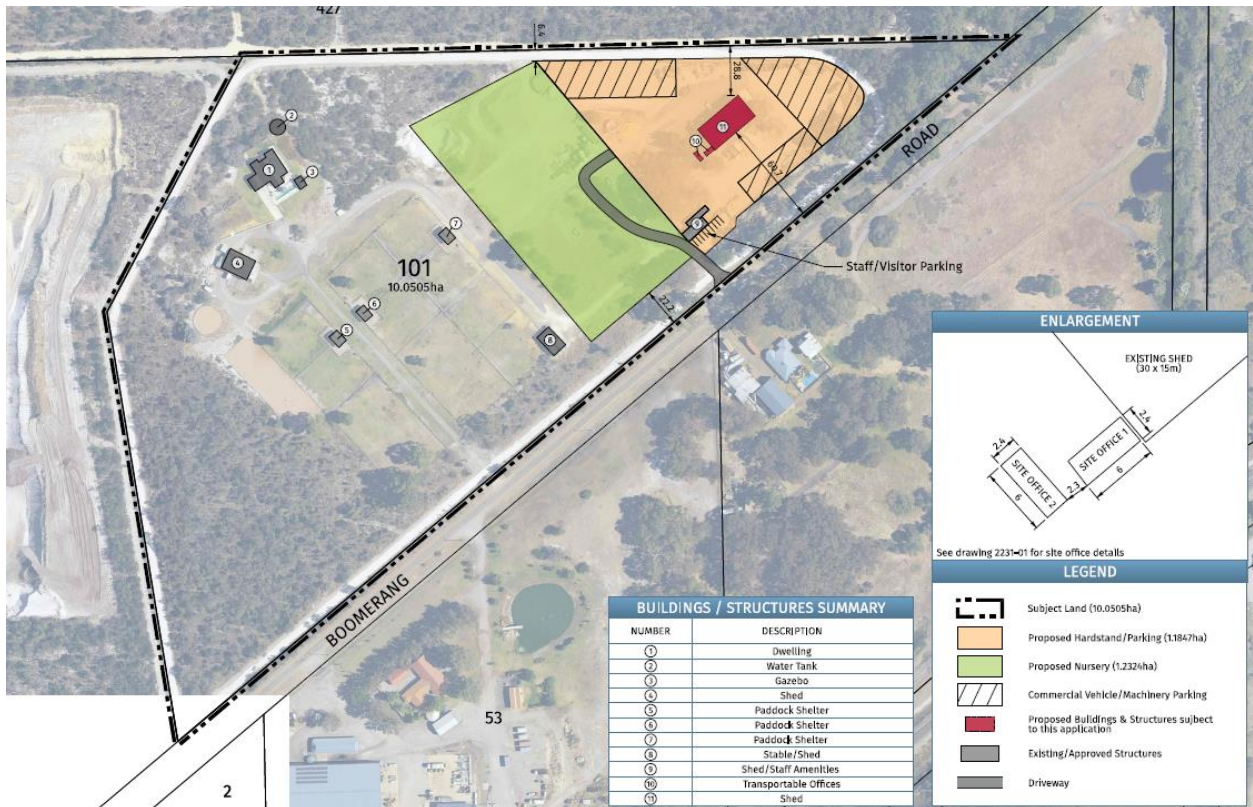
DEVELOPMENT SITE PLAN EXCERPT
